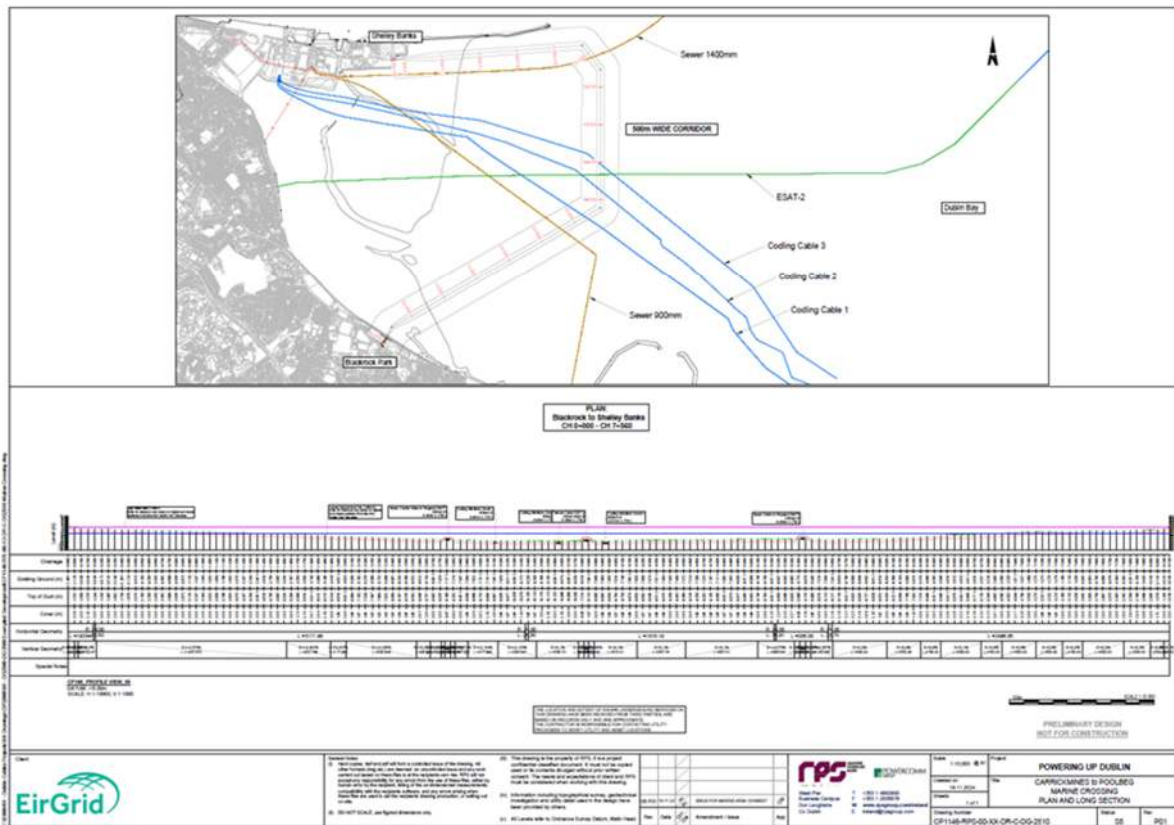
Carrickmines to Poolbeg Marine Crossing Plan and Long Section provided by the Applicant.
